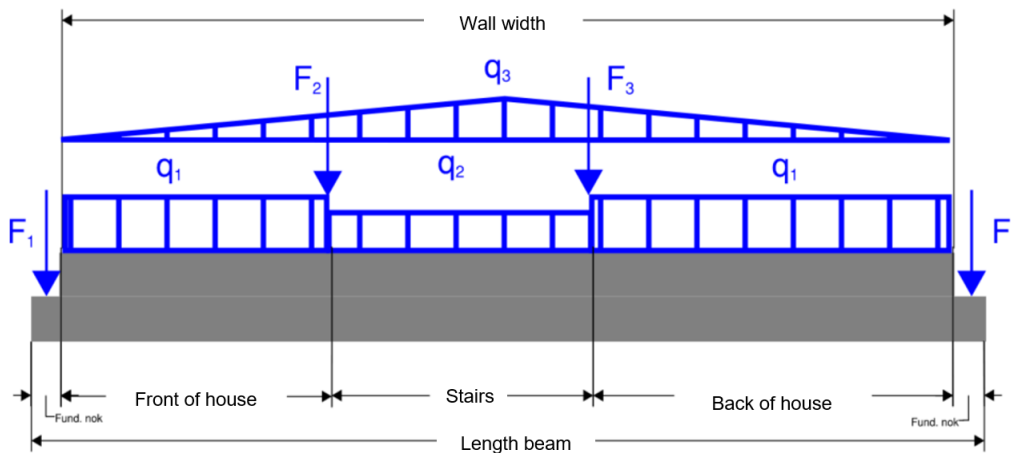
Governing loads on the longitudinal foundation beam of 9.1 meters
